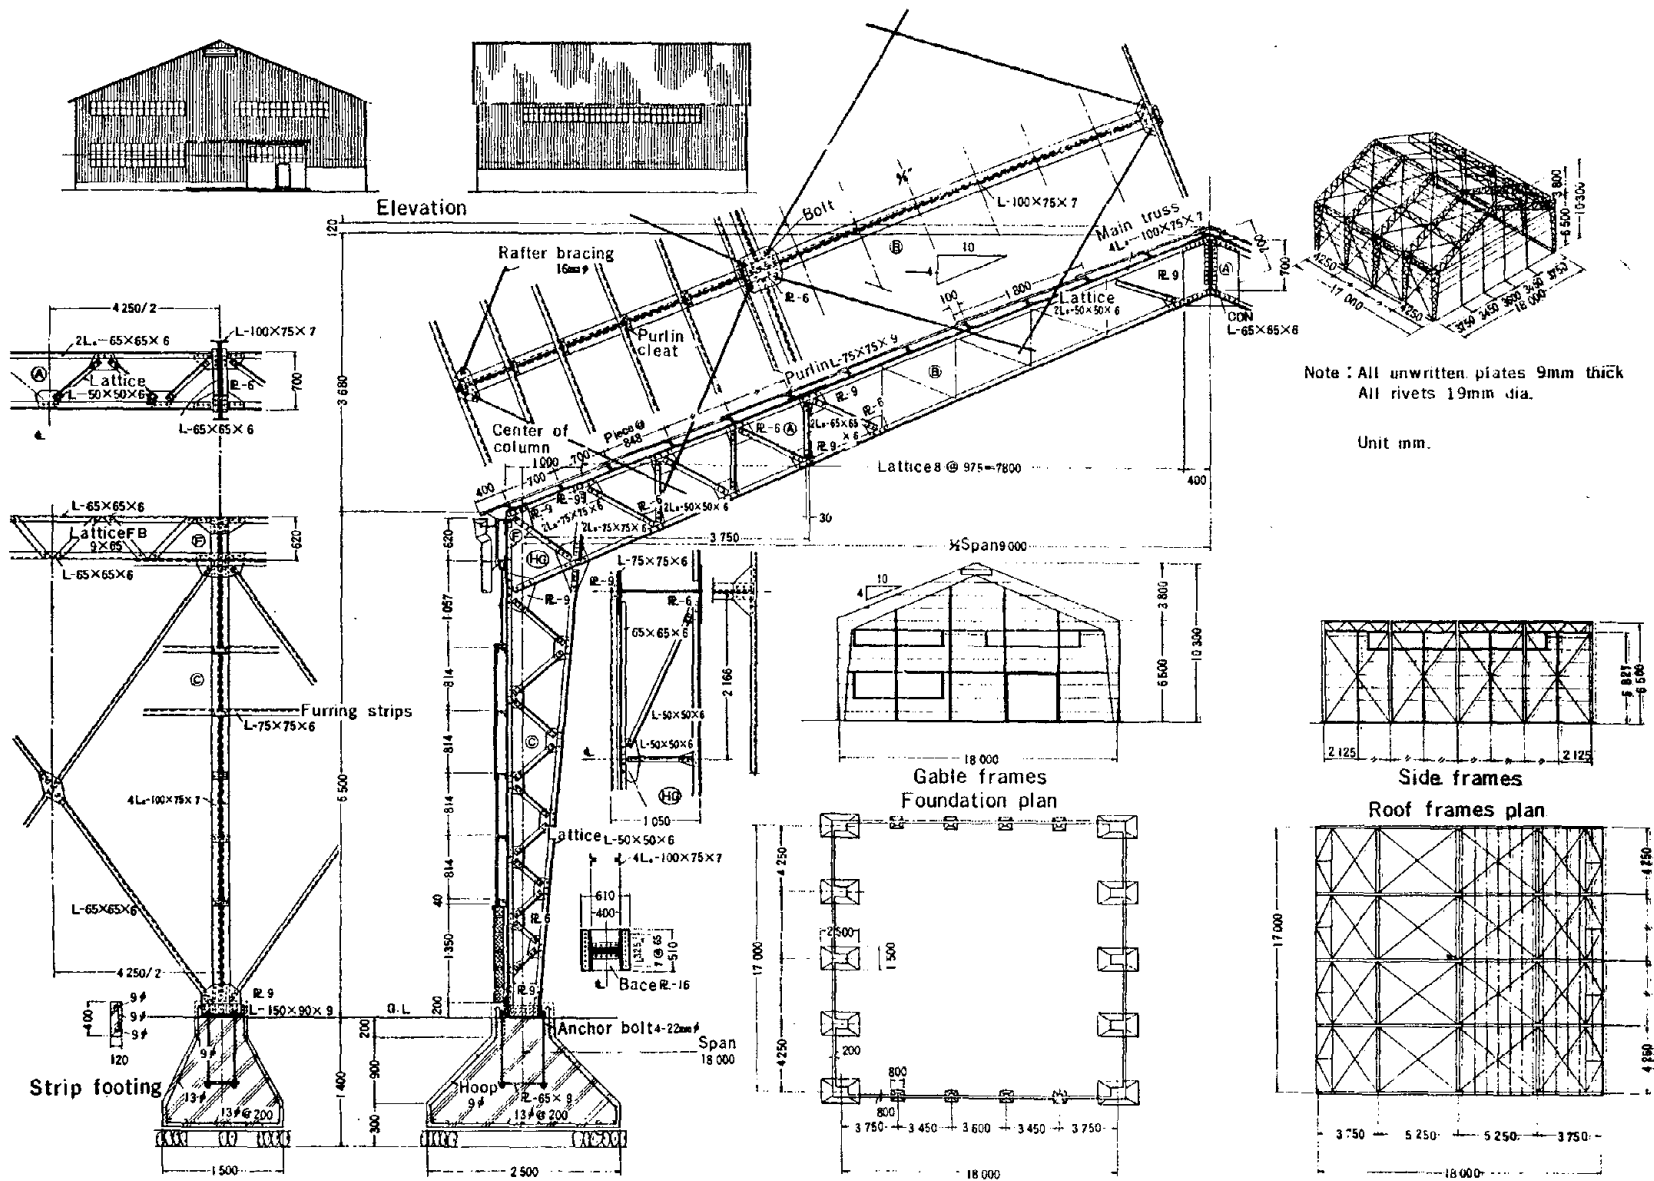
Construction details for a 1950's steel industrial building [AIJ, 1960]
